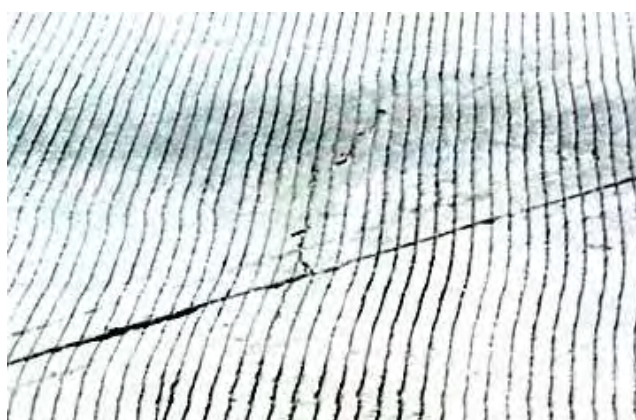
Large Transverse Cracking in the Louetta Bridge Deck (Contrast Raised to Highlight Crack)
